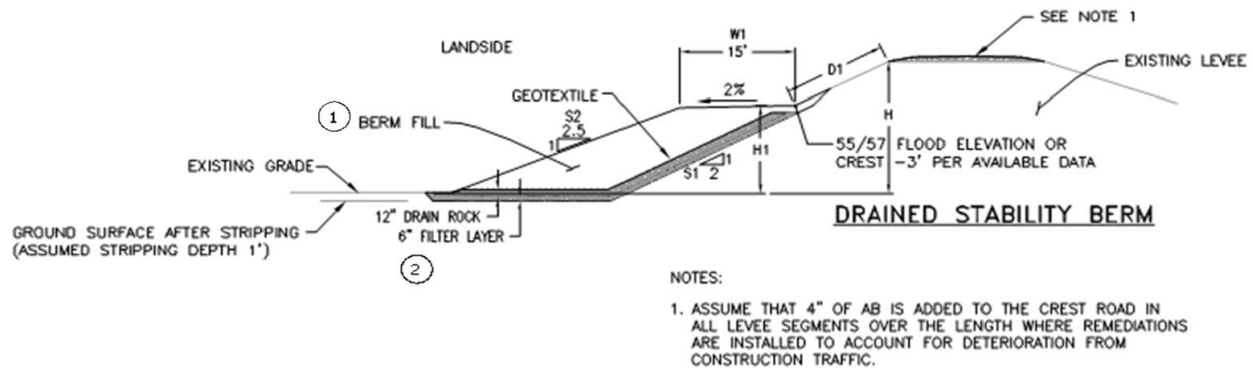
Typical Drained Stability Berm (adapted from URS, 2014b)
